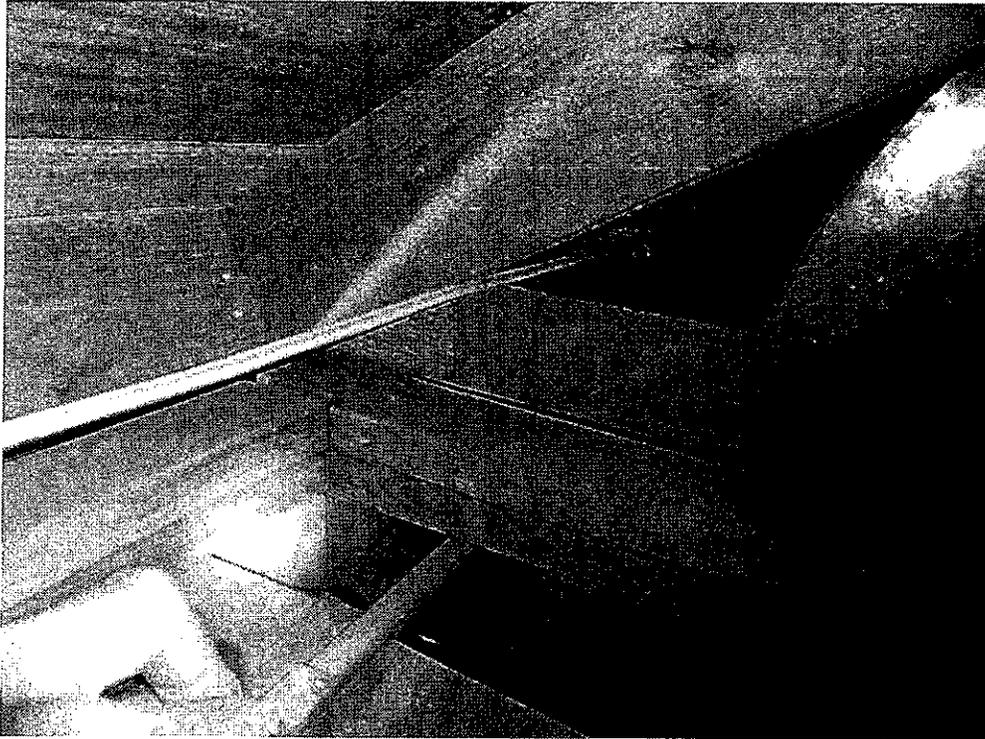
Roof framing and connections/tie-downs appeared in good condition with no significant signs of deterioration
